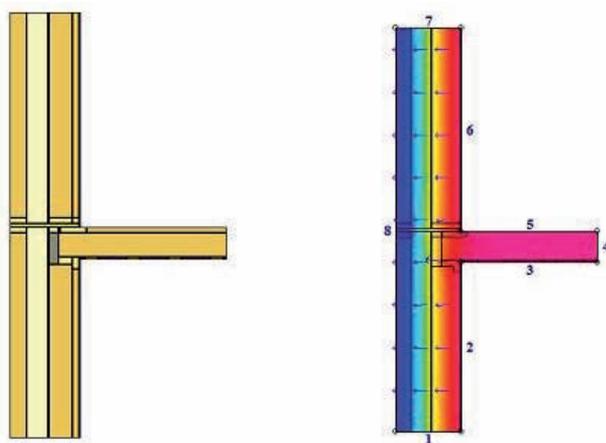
Thermal bridges at connection between floor and outer wall.
